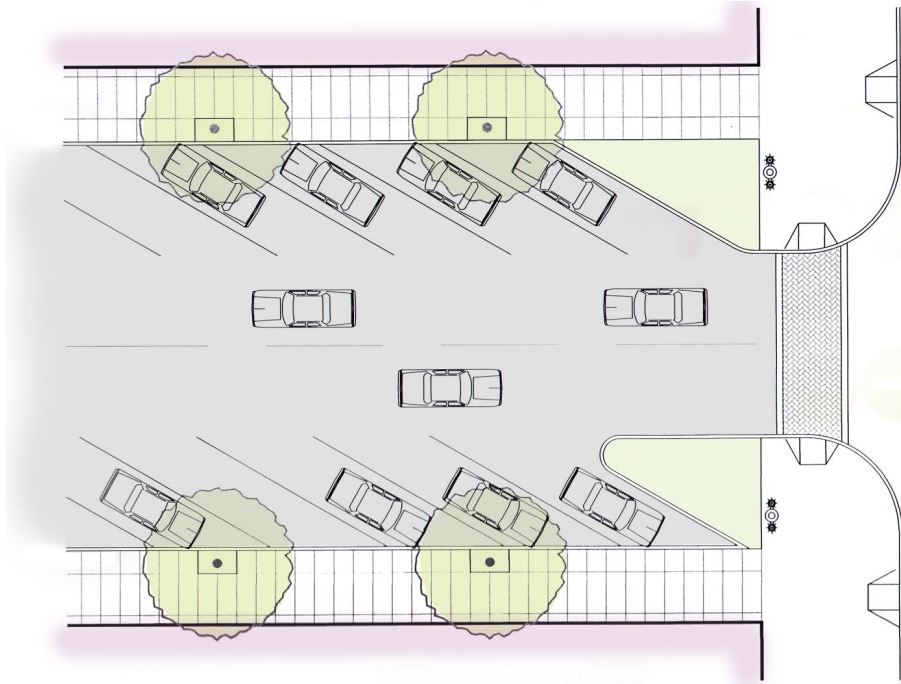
A typical commercial main street in San Mateo County that uses angled on-street parking.
